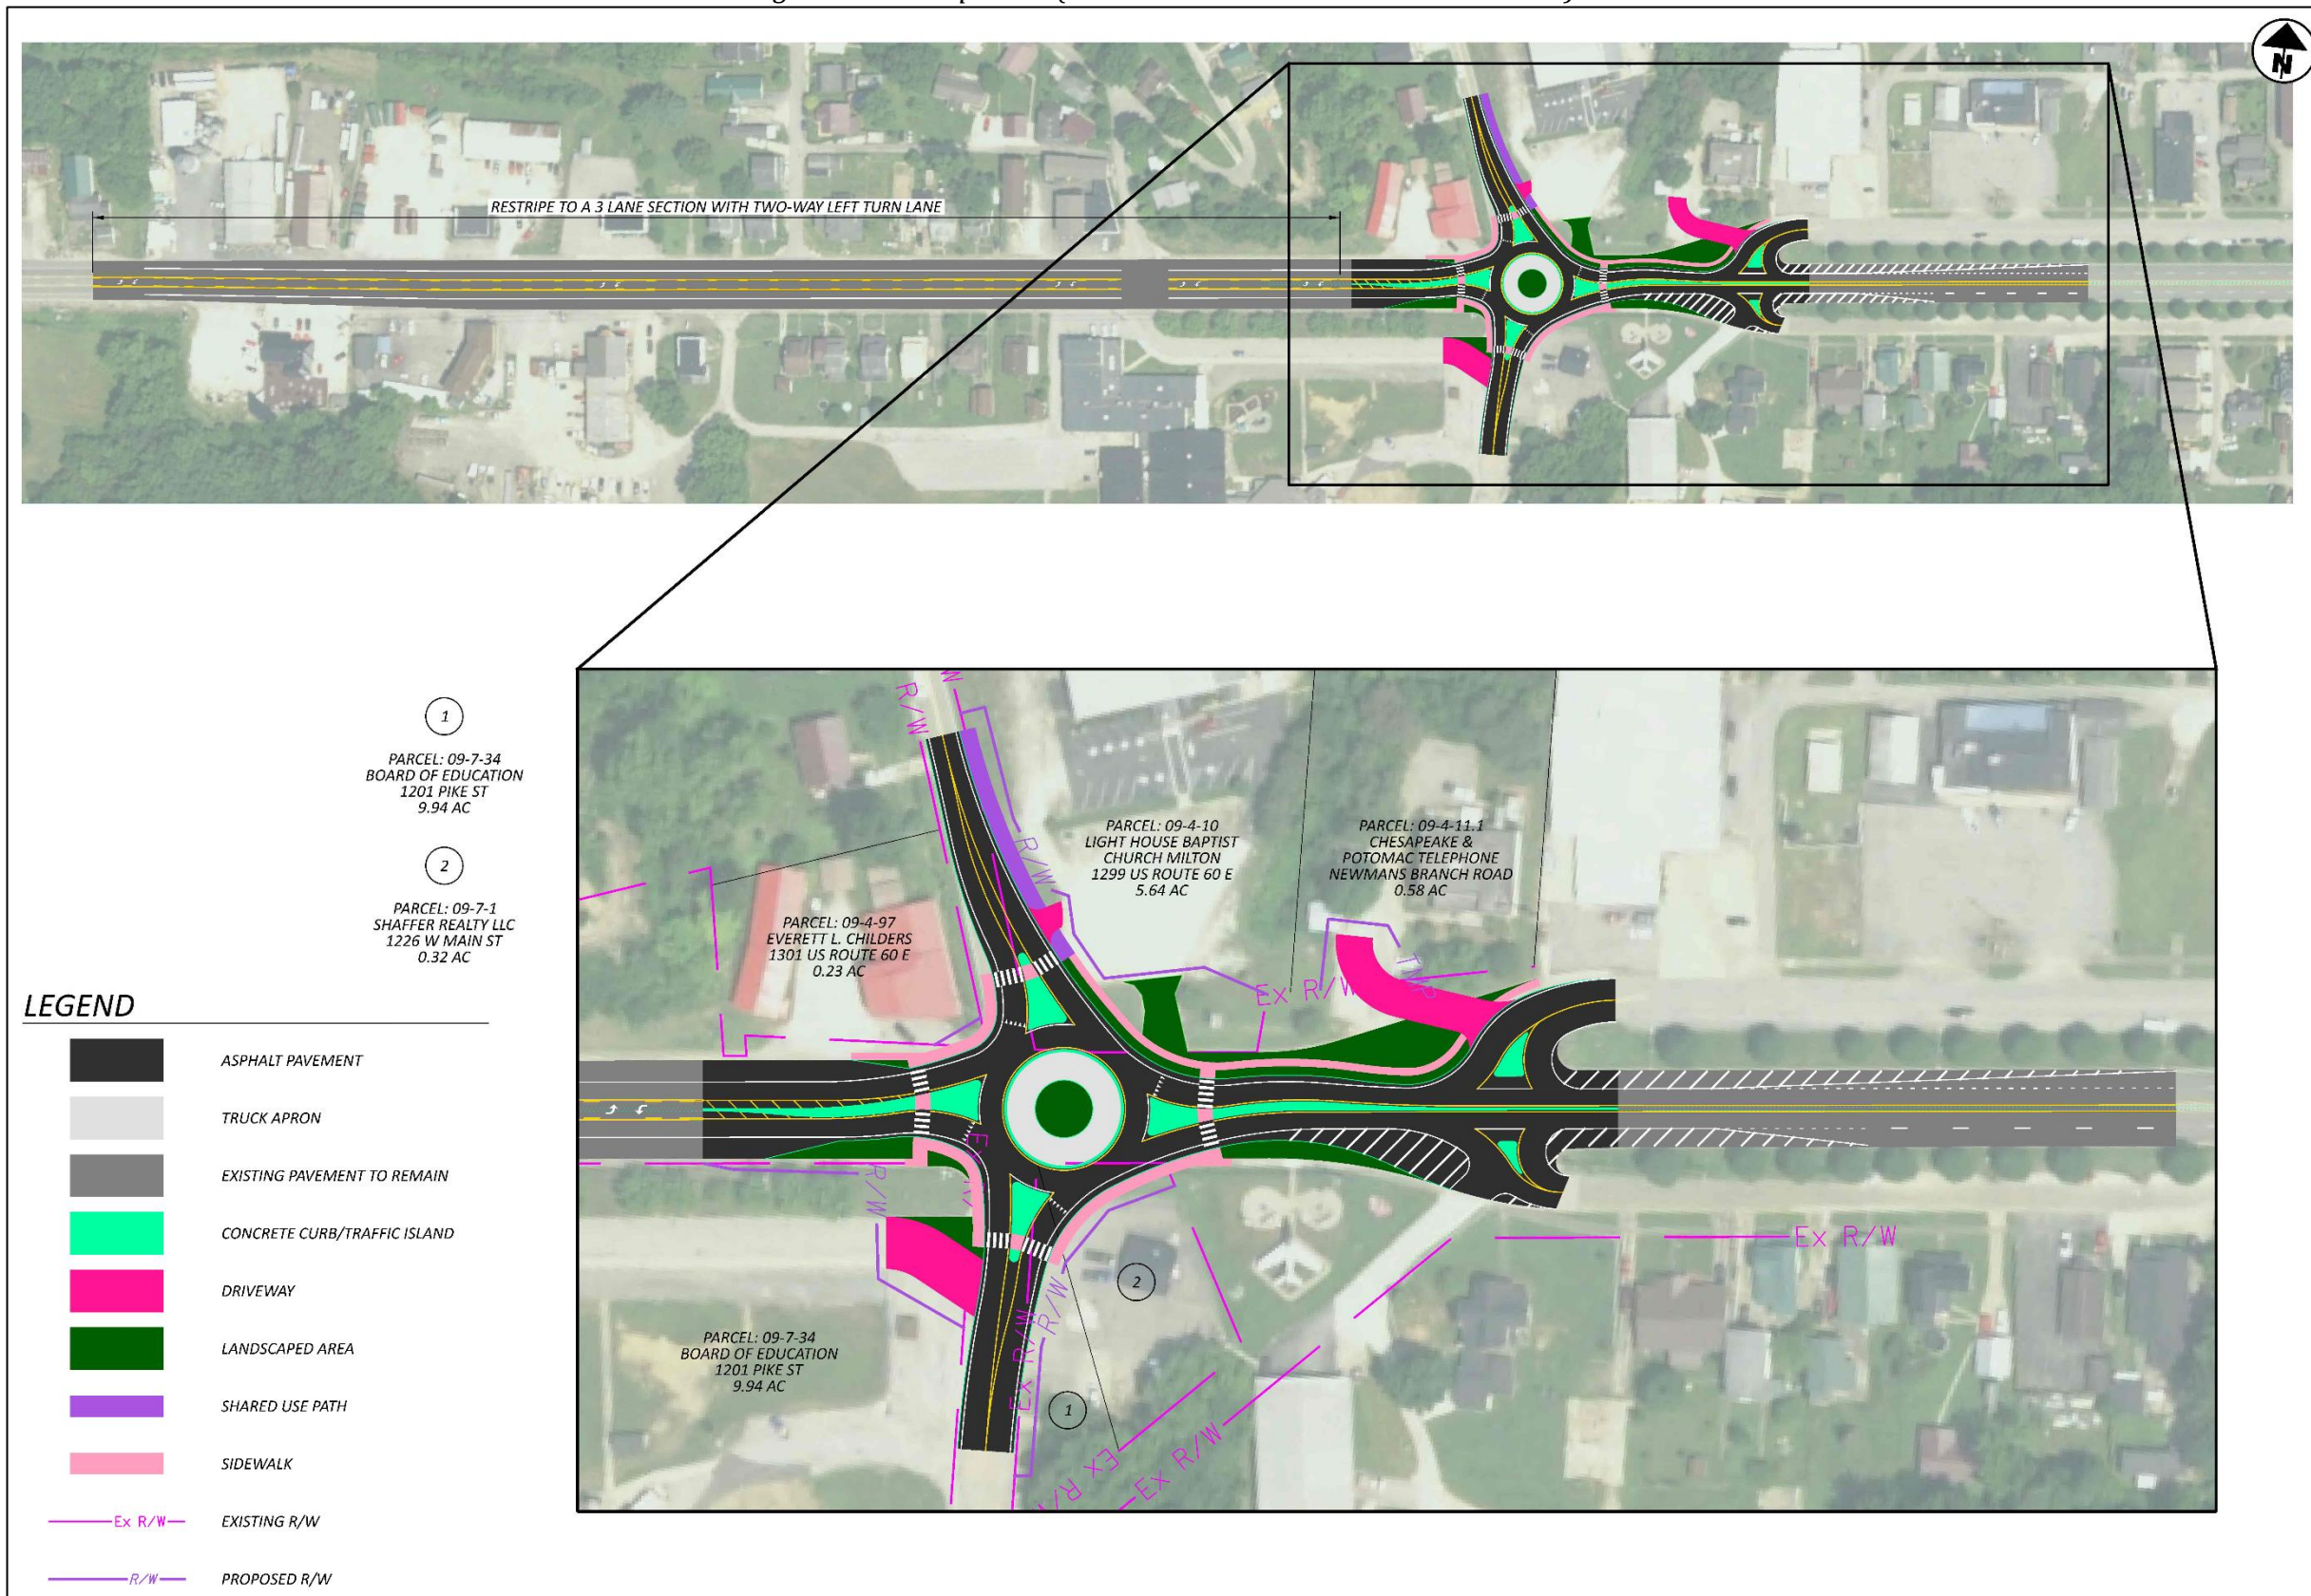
Concept Plan (Newman’s Branch Road Widening)
